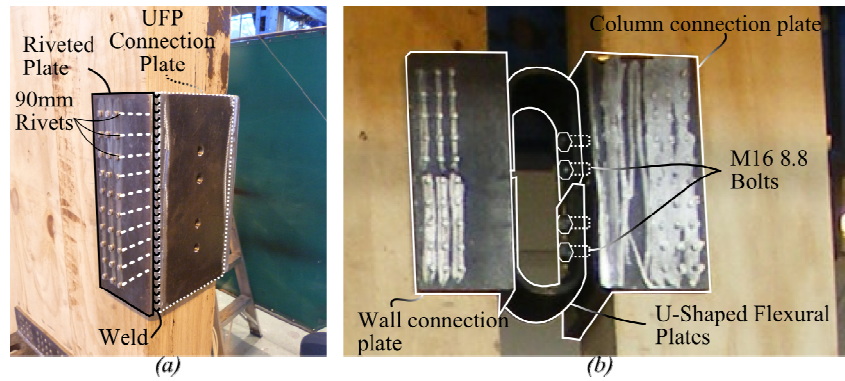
UFP connection: (a) detail of the welded connection and riveted plates; (b) detail of the final setup
